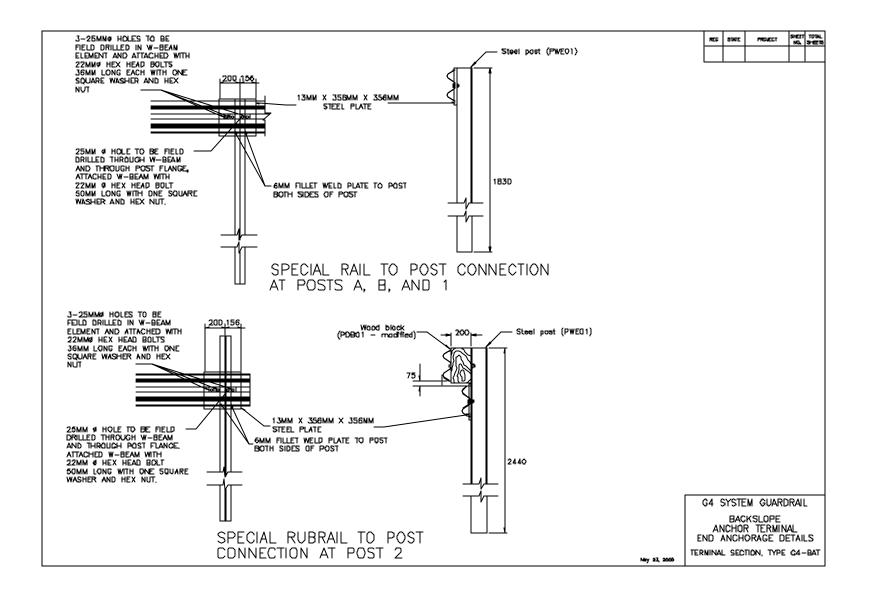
Details of the G4 W-beam guardrail buried-in-backslope installation for test 404211-13 (continued).
